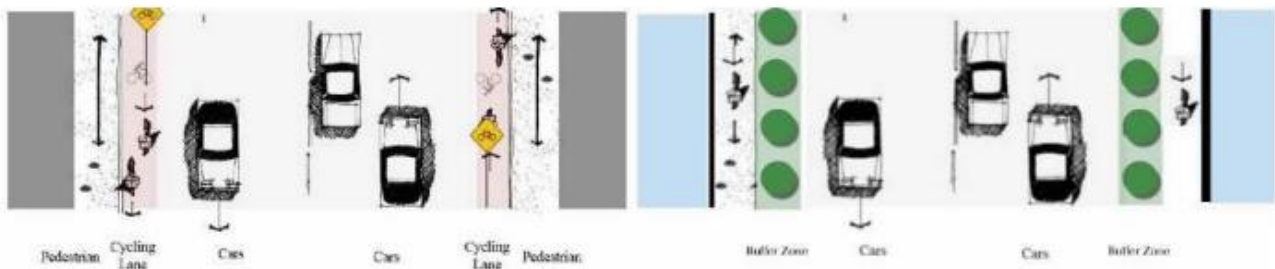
To the left plan sketch for the signed bike lanes; to the right plan sketch for the Shared
